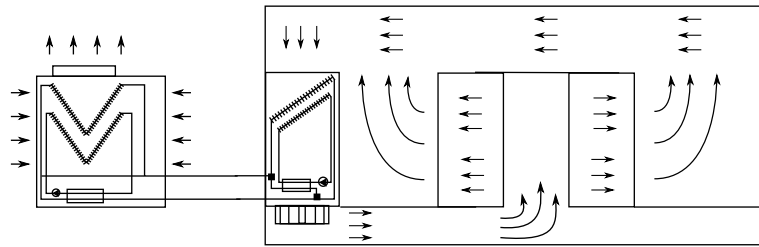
A packaged air cooled chiller with free cooling coil operating with a chilled water CRAC Unit.
